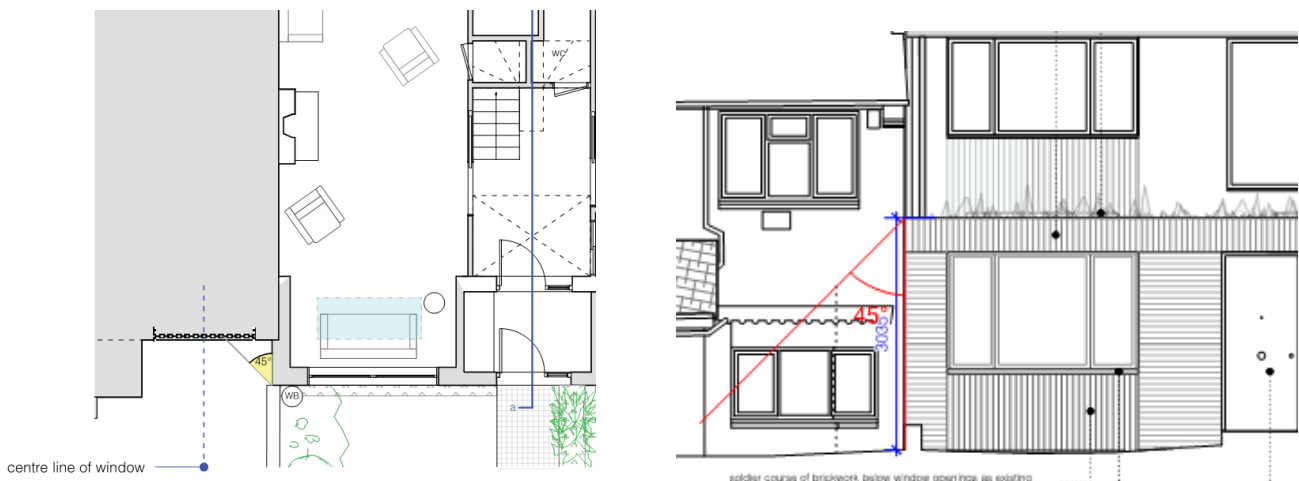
Plan (left) and elevation (right) drawings showing 45 degree test for rear extension.
